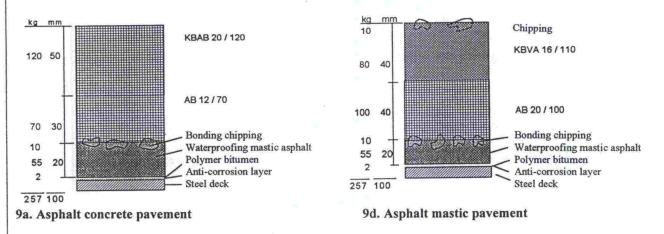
Surface structure of a roadway on a bridge with steel deck without fixing steel components
